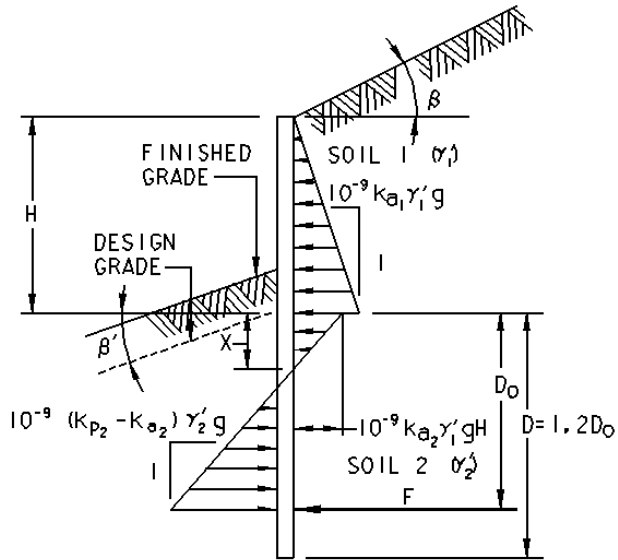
Simplified Earth Pressure Distributions for Permanent Nongravity Cantilevered Walls with Continuous Vertical Wall Elements modified after Teng (1962)
